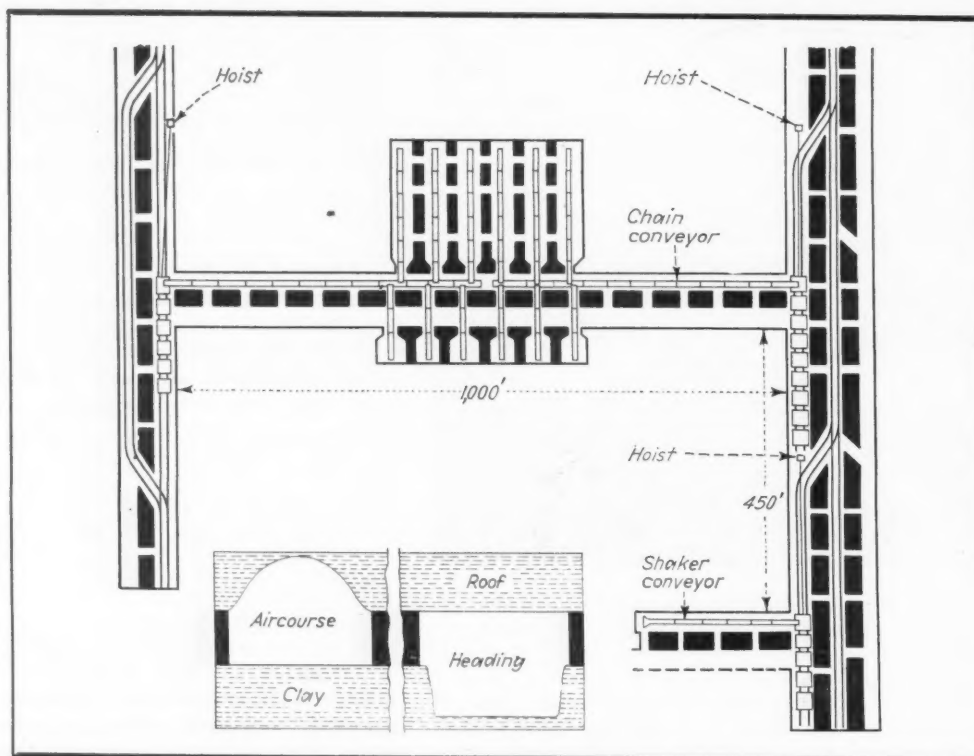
New plan of conveyor work showing heading and aircourse rooms working.
